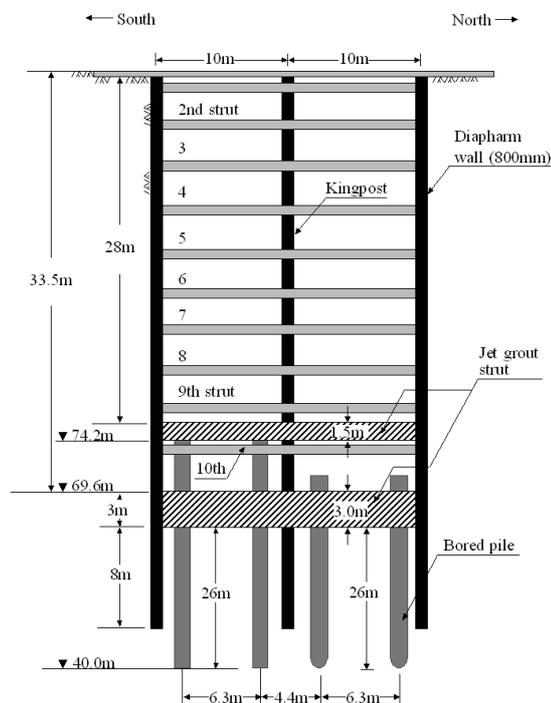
A typical side view of the strutted system for the A-A' cross section
